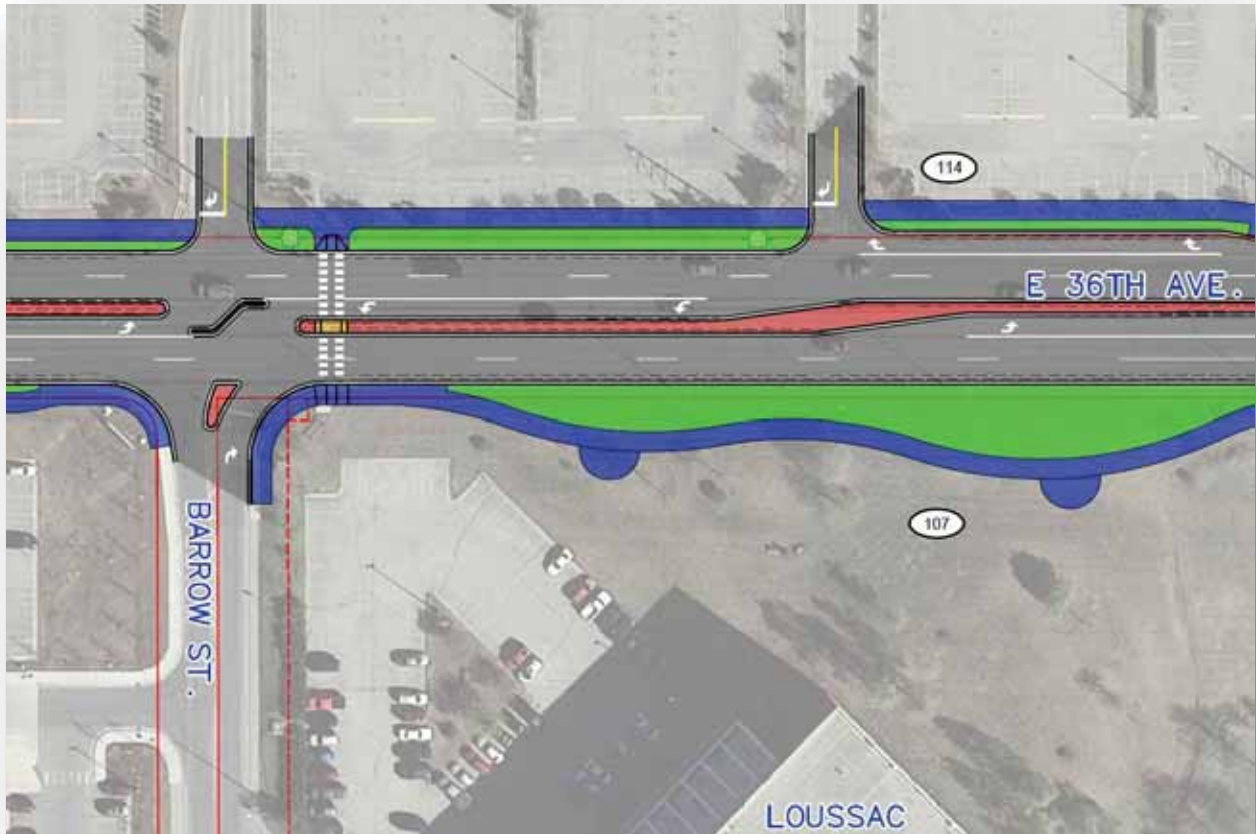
36th Avenue and Barrow Street Pedestrian Crossing Alternative
